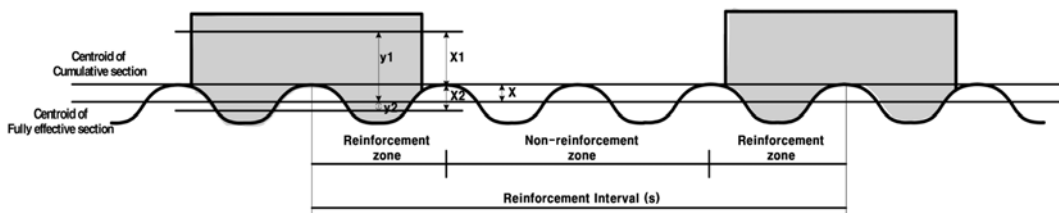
Pitch corrugated steel plate reinforced composite section (s = 1,600 mm)
